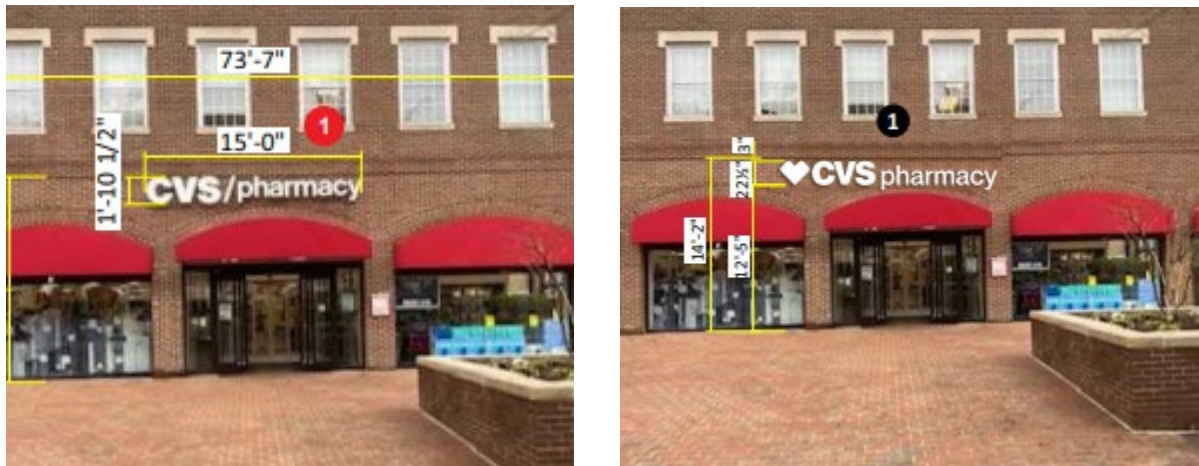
Existing CVS signage (left) and proposed signage (right) on King Street elevation
